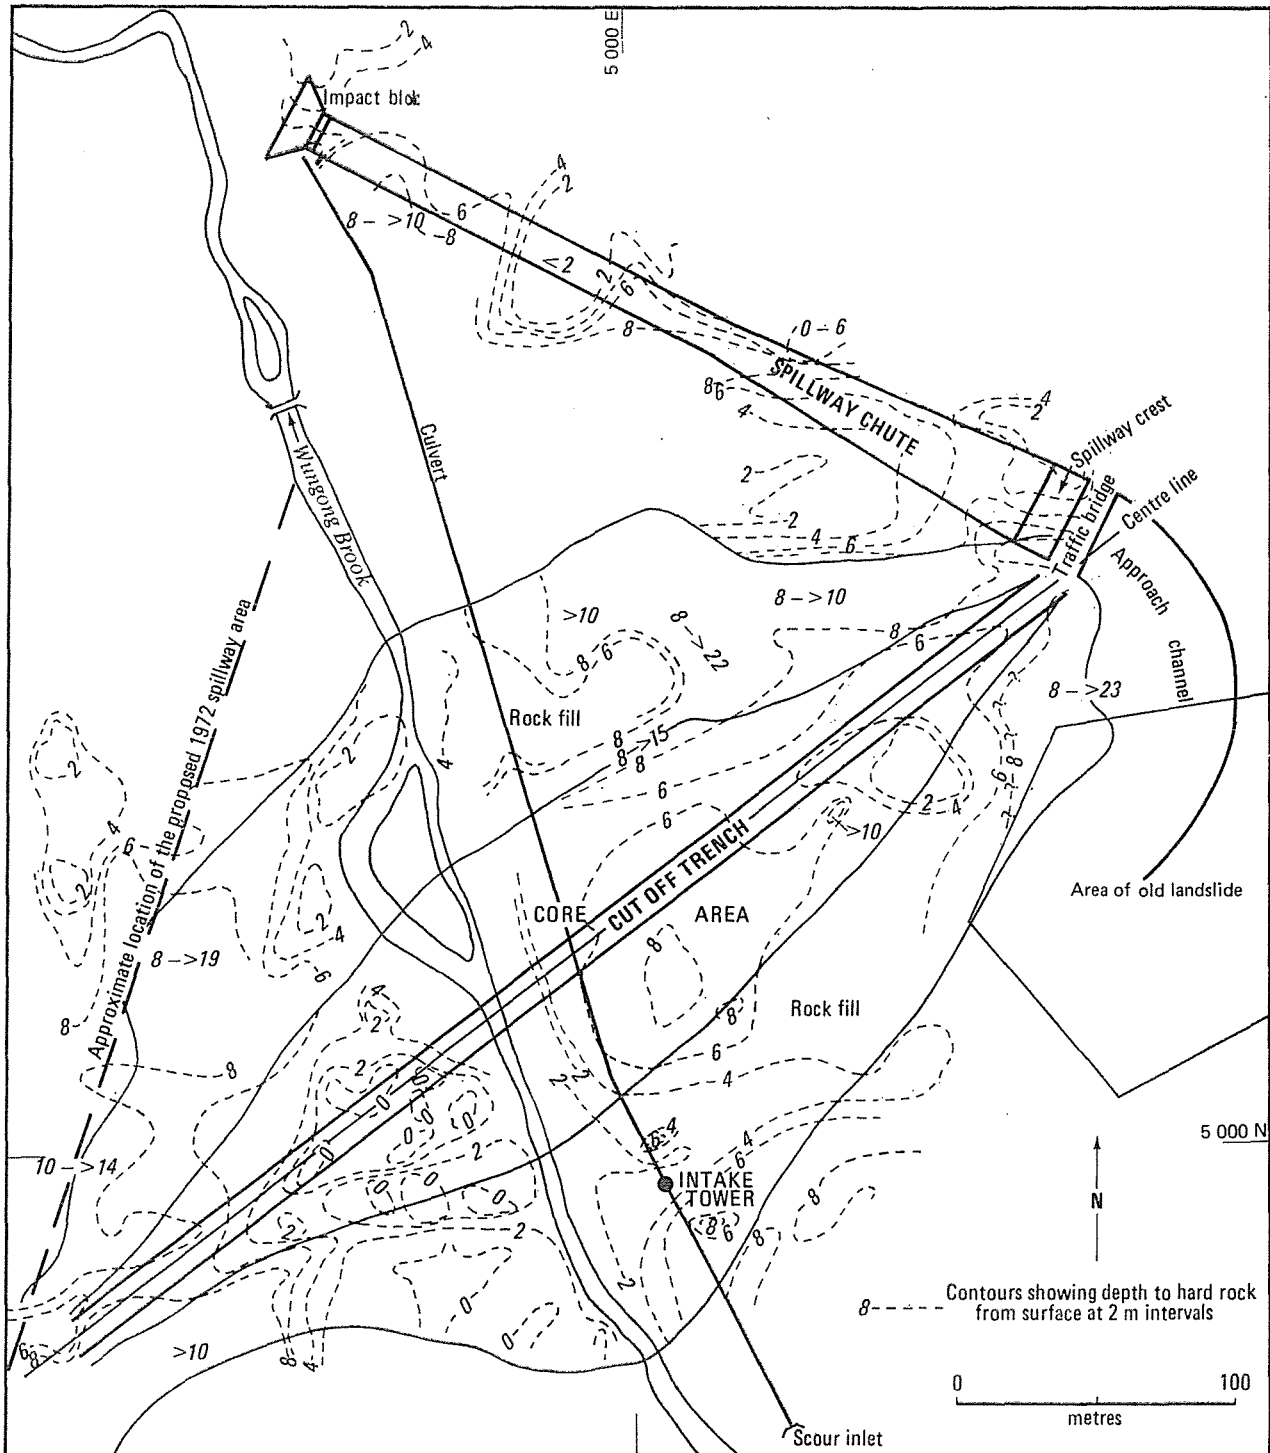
Site plan showing bed-rock depths, and final position of structure.
